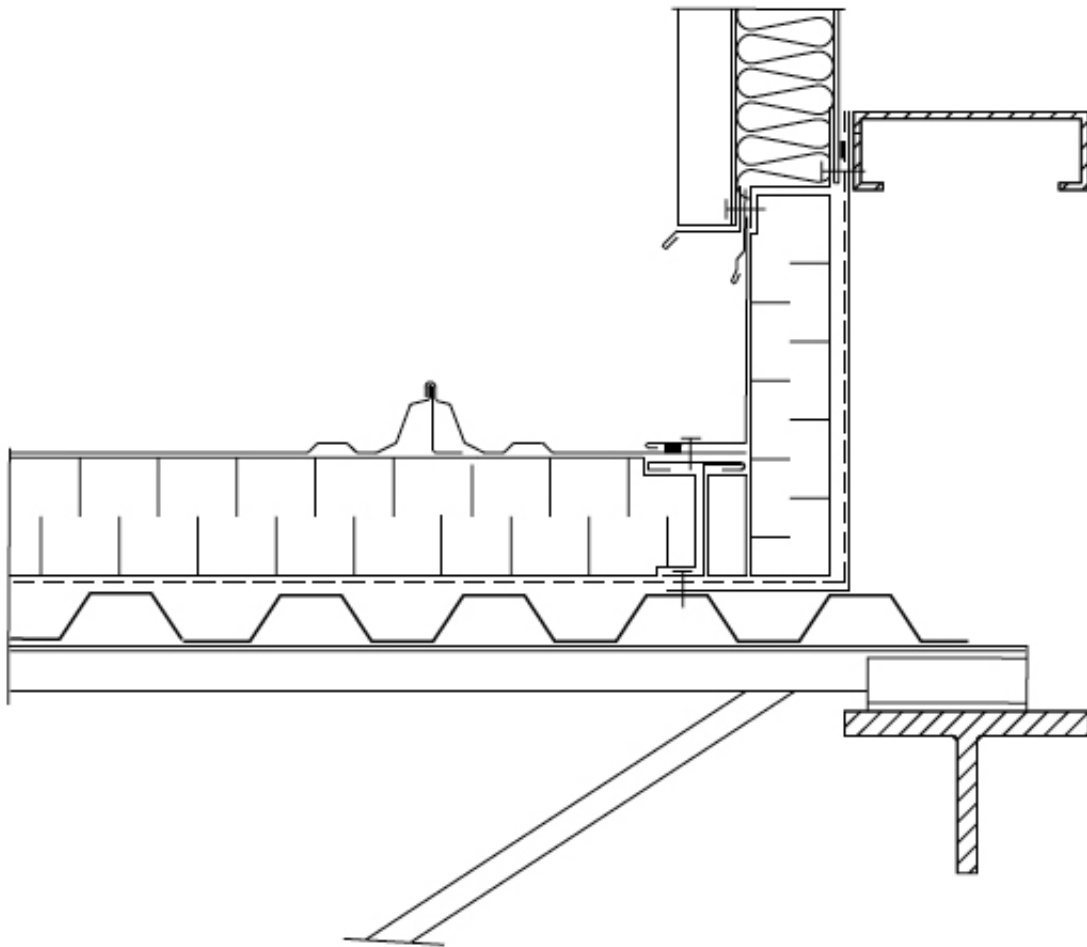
A: Roof to Wall Parallel to Sheet - Insulated Sheet Steel Wall
